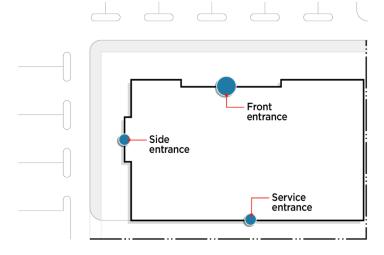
Large Lot Commercial Building Type with Detached Outlot/Liner Commercial Building Type Building Entrance
